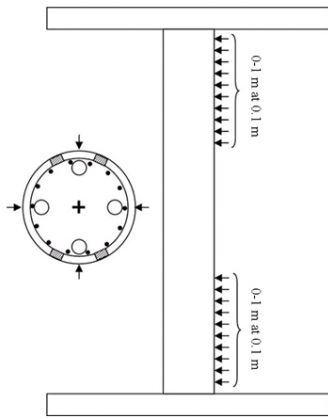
Elevated and sectional view of a column and the location of IE test points are marked with arrows.
